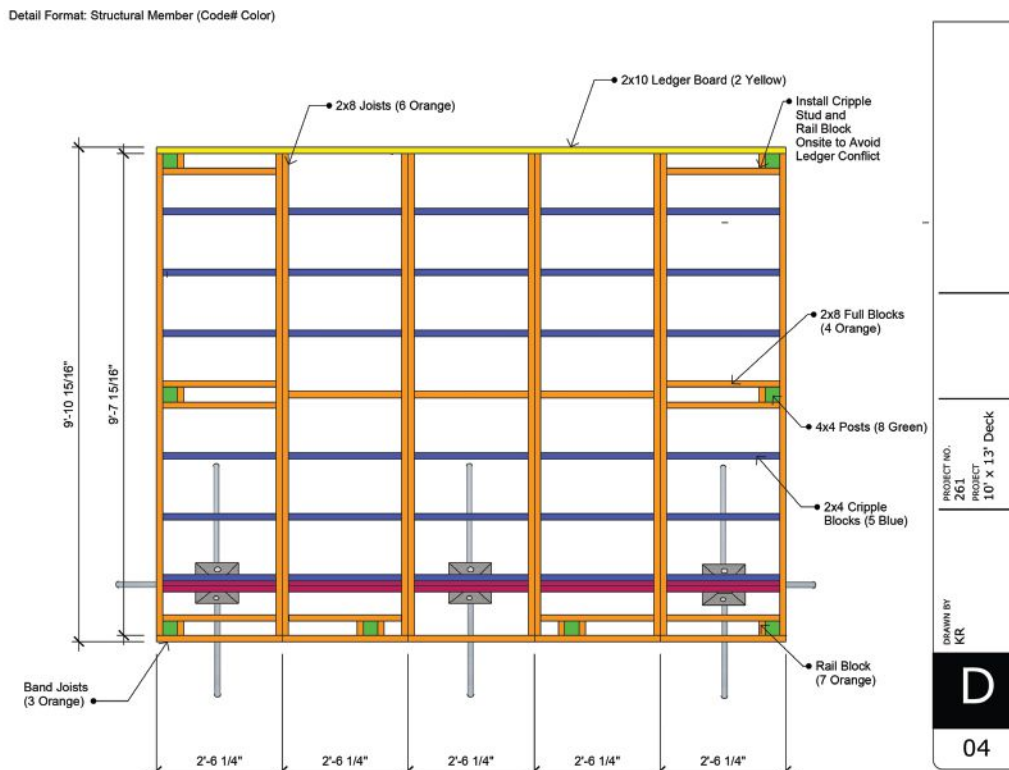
Here is a typical framing plan for a 10-by-13-foot modular deck, which the author designed using SketchUp. This design consists of 2-foot 6 1/4-inch-wide modules that are fabricated in the shop, then later assembled on site.
